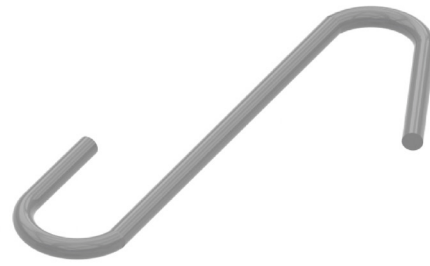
Geometry of the S-shaped cross-tie rebar for the connection between two longitudinal rebars in the shear walls (author's own work)
